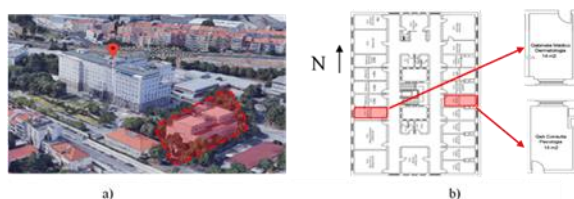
Location of case study: a) location of the building in the enclosure of IPO; b) plan of the 2nd floor, with the location of the monitored offices
